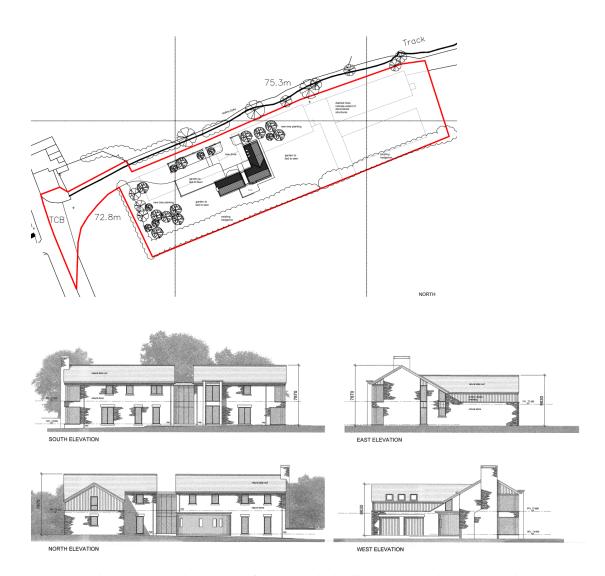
layout and elevations of proposed dwelling under Planning Application No. 3/2015/0509/Appeal Ref No. APP/T2350/W/16/3152831
